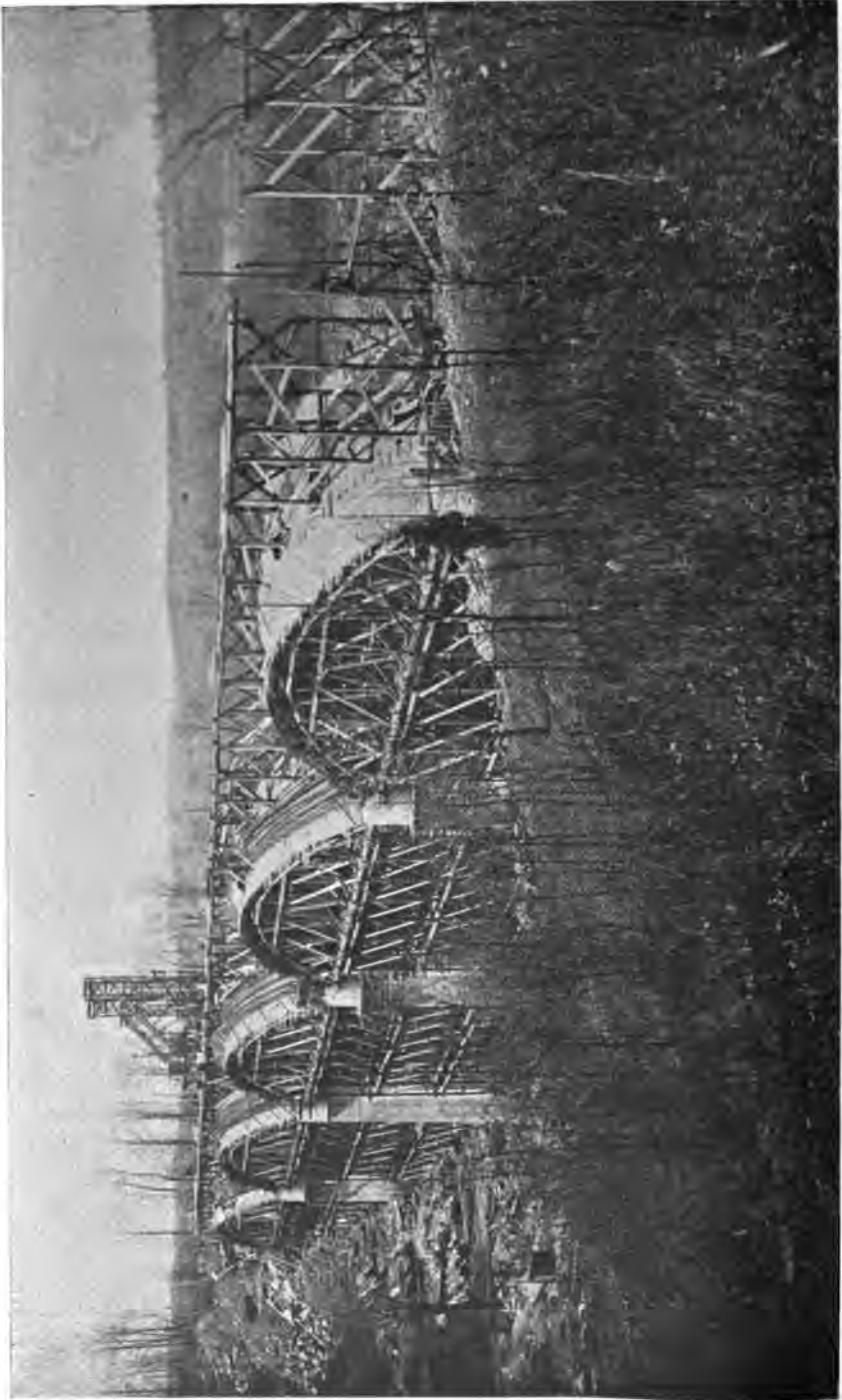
Contract 9. Rye Outlet Bridge; Forms in Position. General View Showing Tower for Raising Concrete, Tracks, etc.
